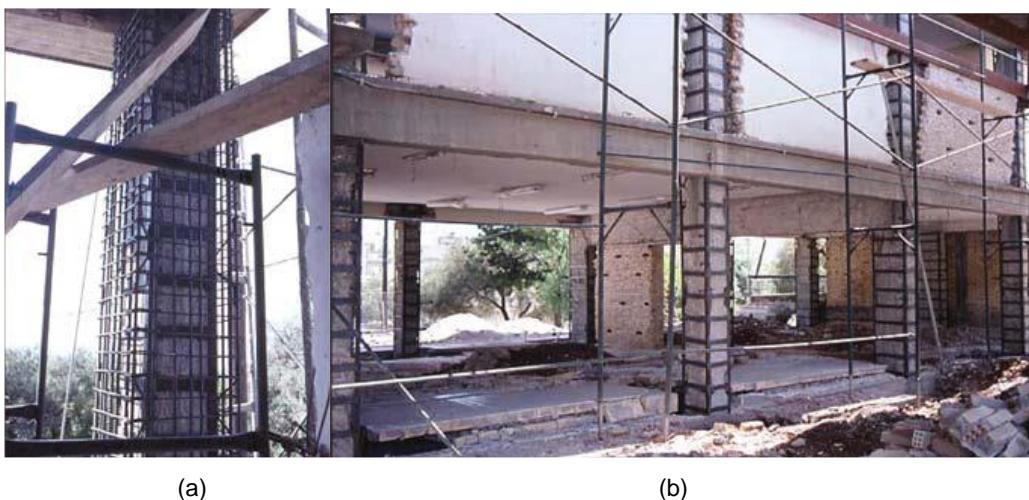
Steel jackets built-up in situ with corner angles and horizontal straps
